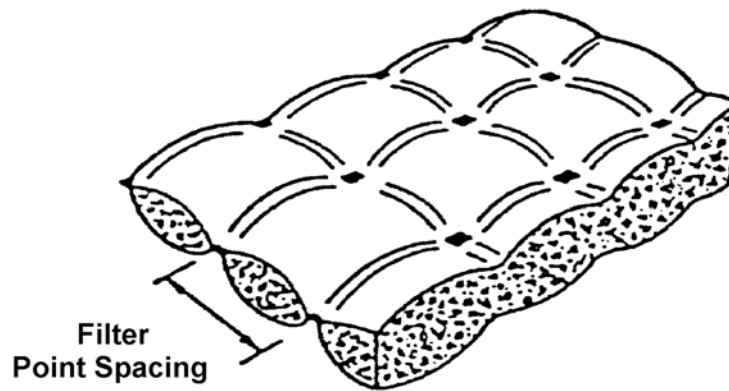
Type 1 Grouted Fabric-Formed Revetment
